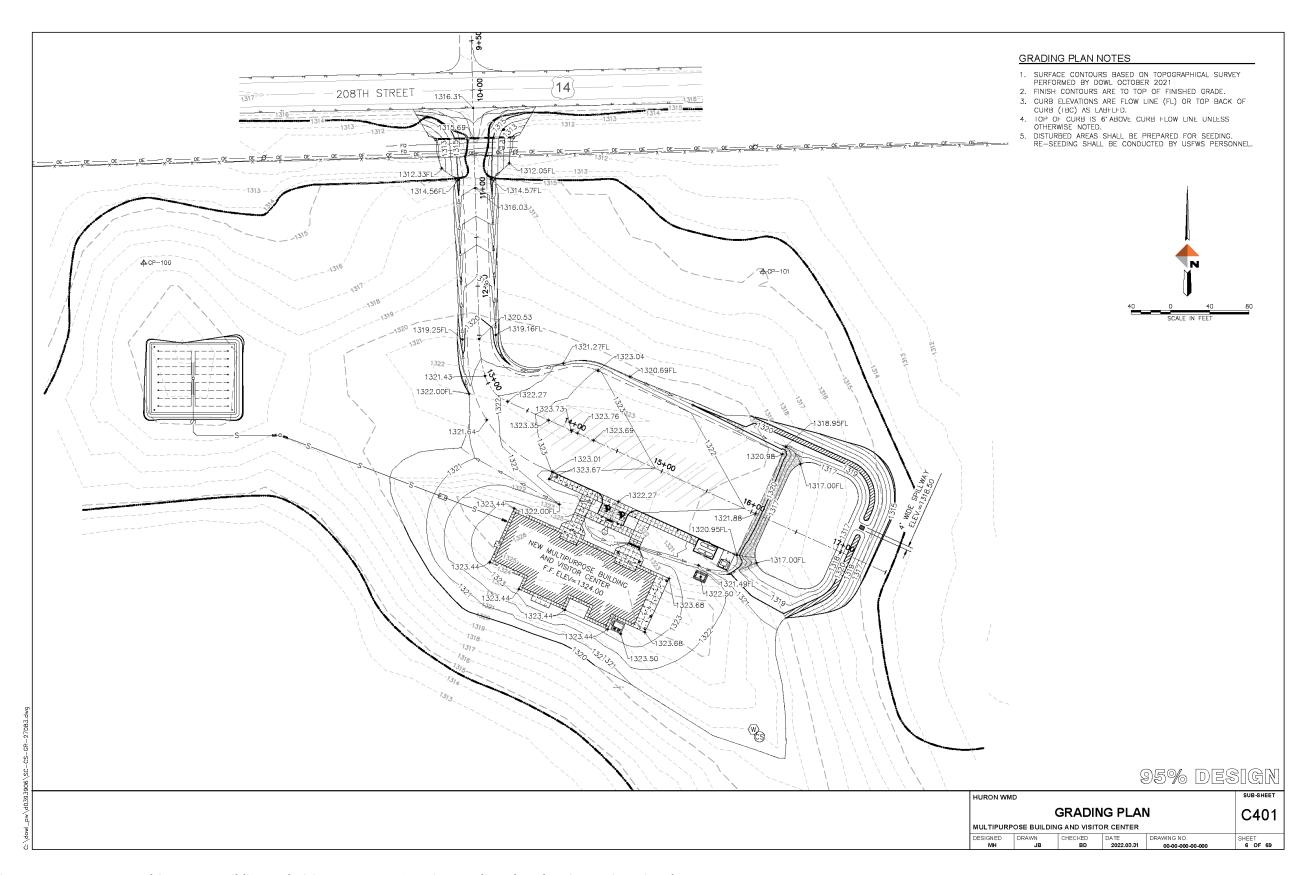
Huron WMD Multipurpose Building and Visitor Center 95% Design Grading Plan Showing Project Site Plan
